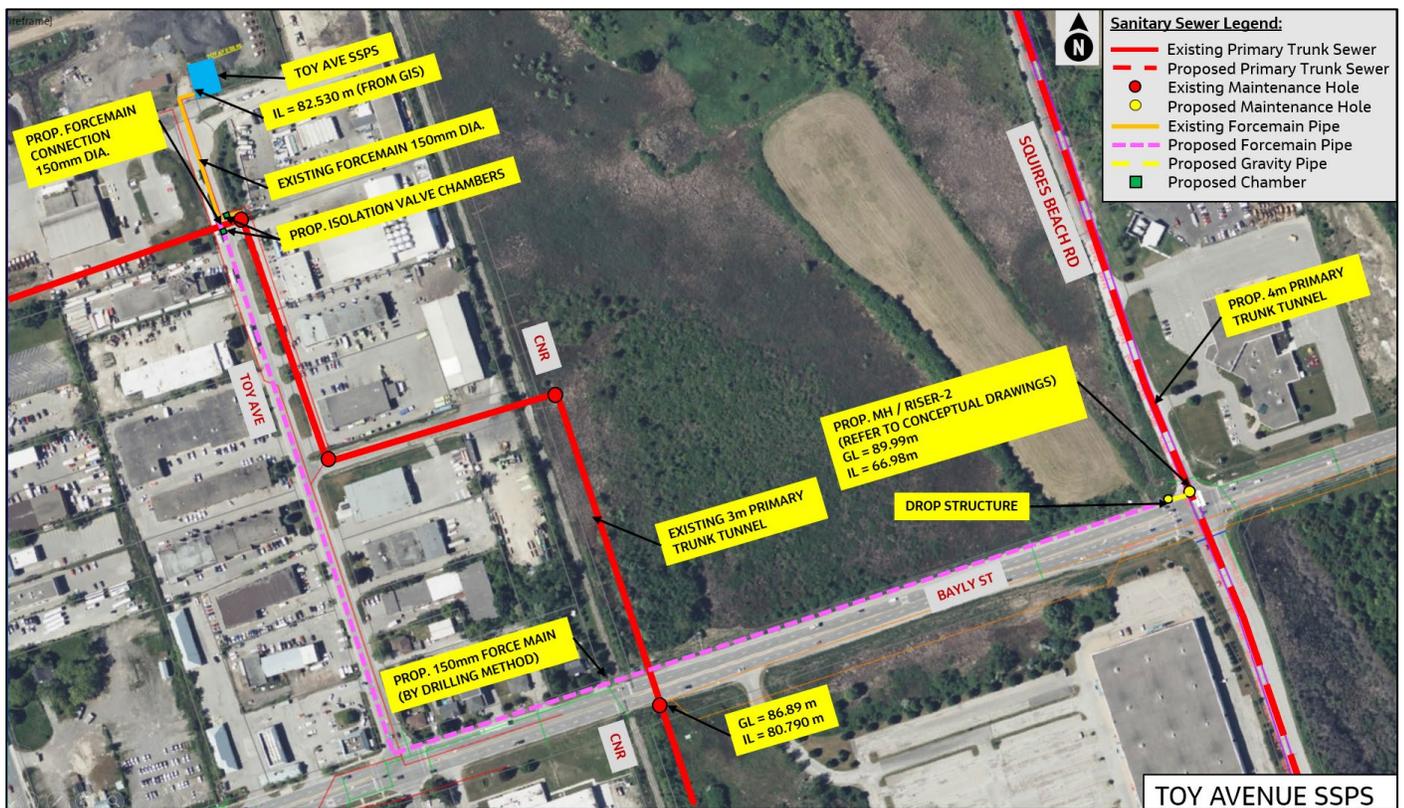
Connection of Toy Avenue SPS to the Proposed Primary Trunk Sewer
